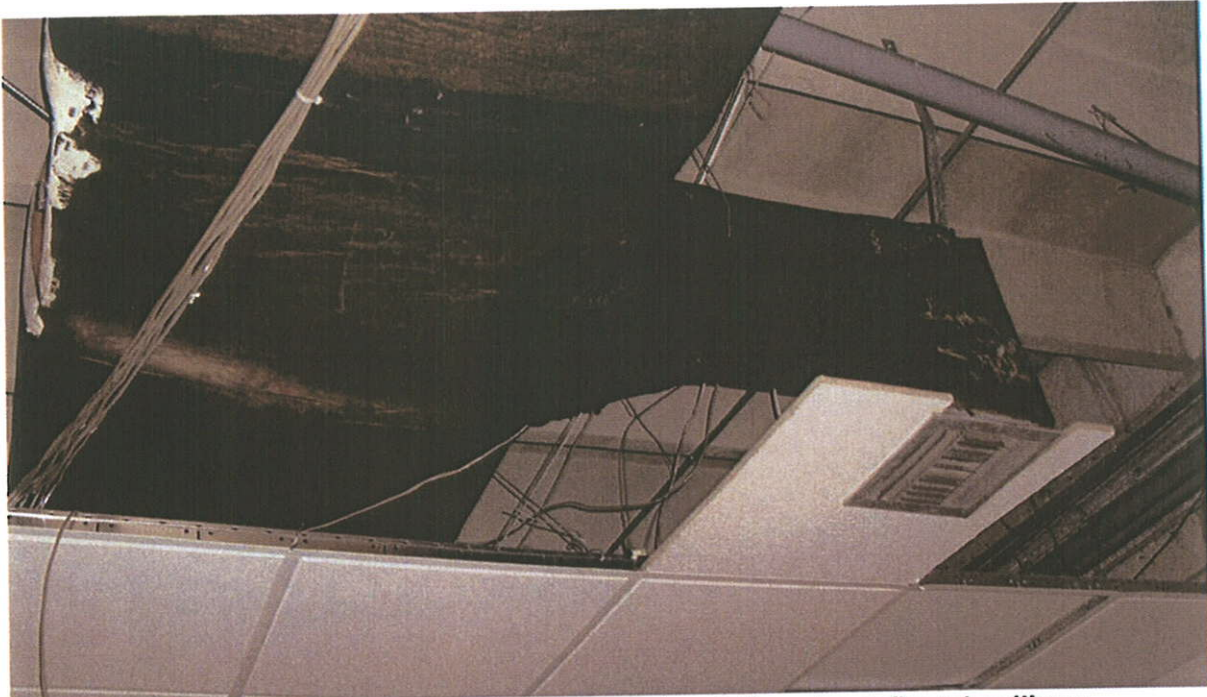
ACM HVAC with brown paper insulation above floor 1 ceilings
